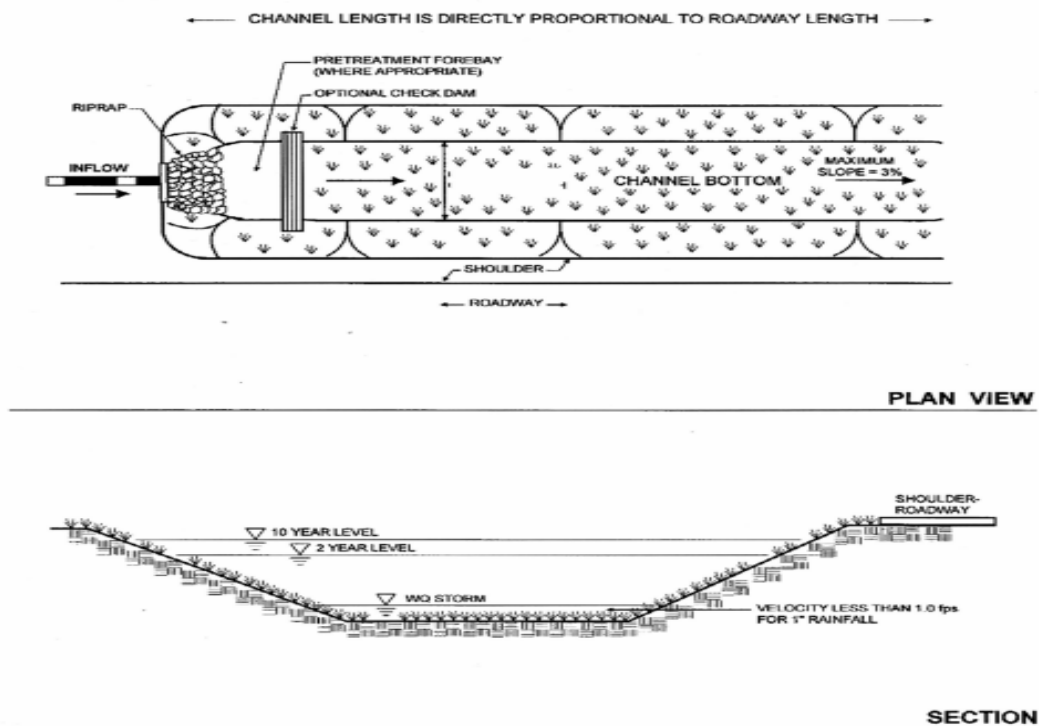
Plan view and section of a typical grassed channel (Source: www.stormwatercenter.net).
